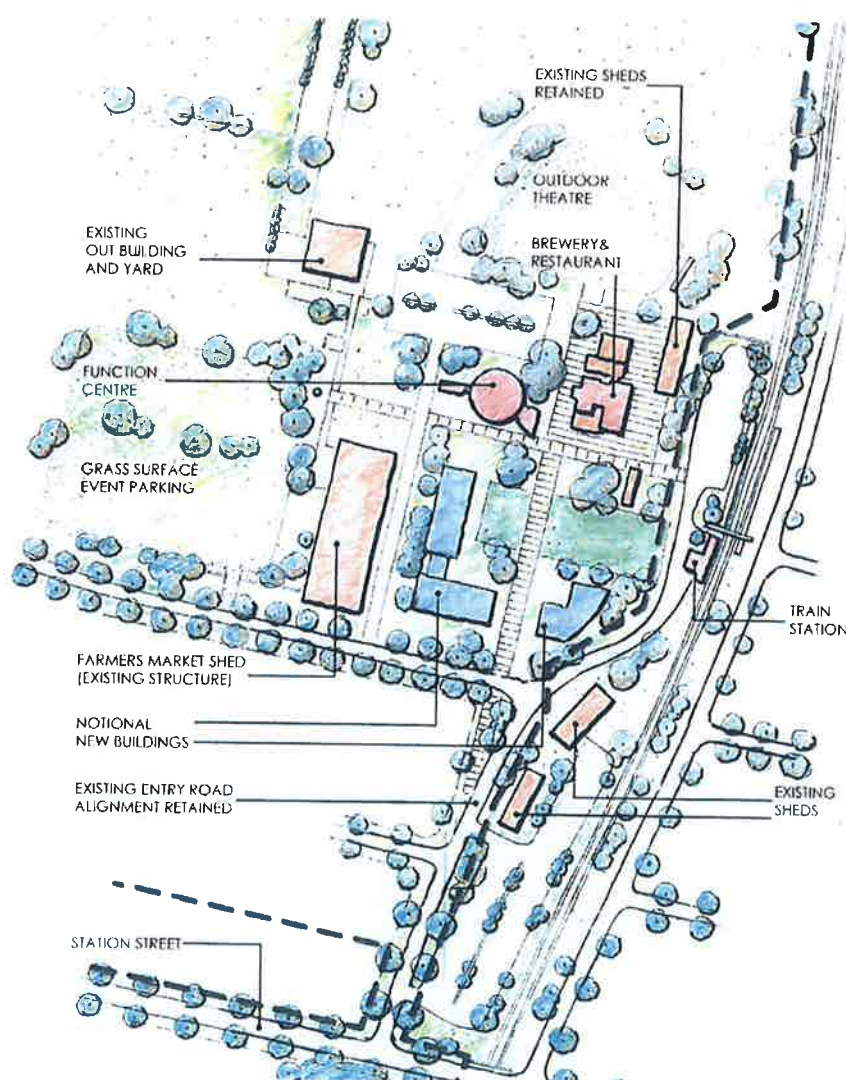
Creamery Concept Plan Source: Cox Station Street Menangle Planning Proposal (Stage 1)
